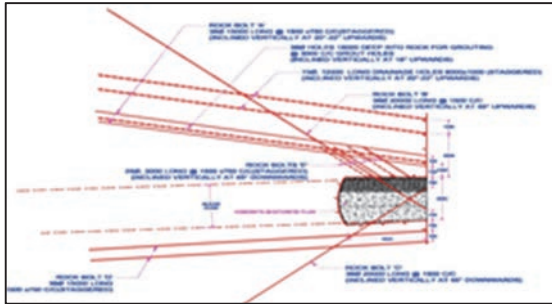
Concrete plug and Rock Bolt Arrangement for Shear zone Treatment
